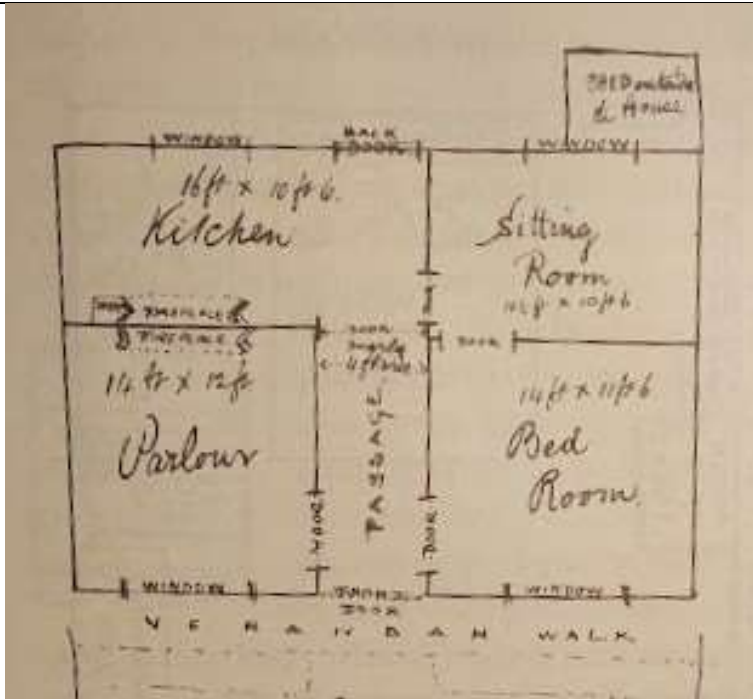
Plan of Joseph Elliott's House, Adelaide, 1860 (*Our Home in Australia*, Flannel Flower Press, 1984)
